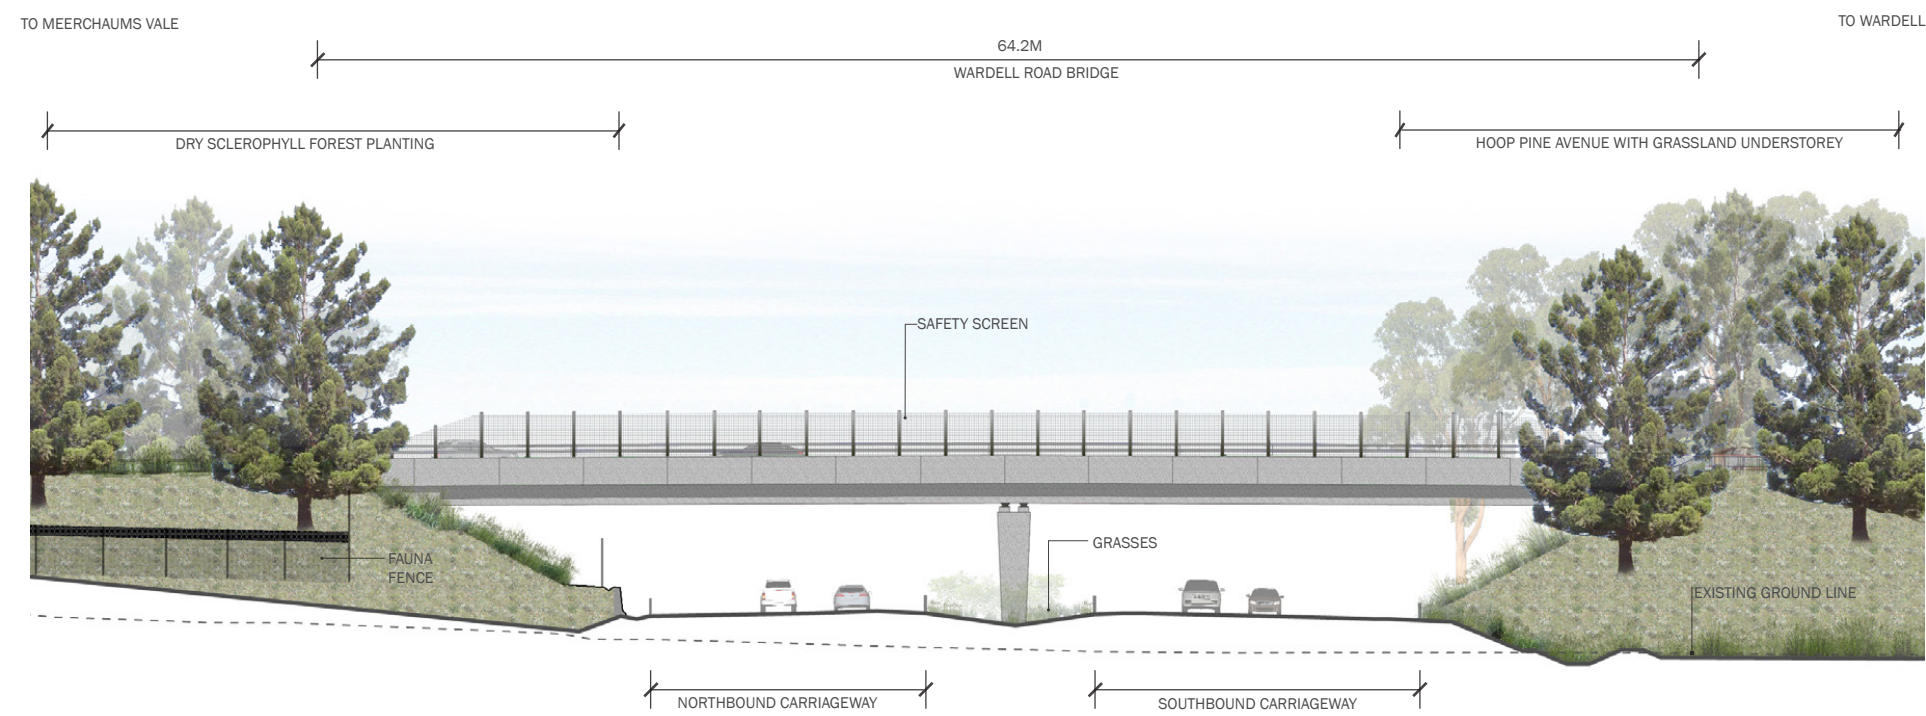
Wardell Road overbridge elevation (Scale 1:400)
